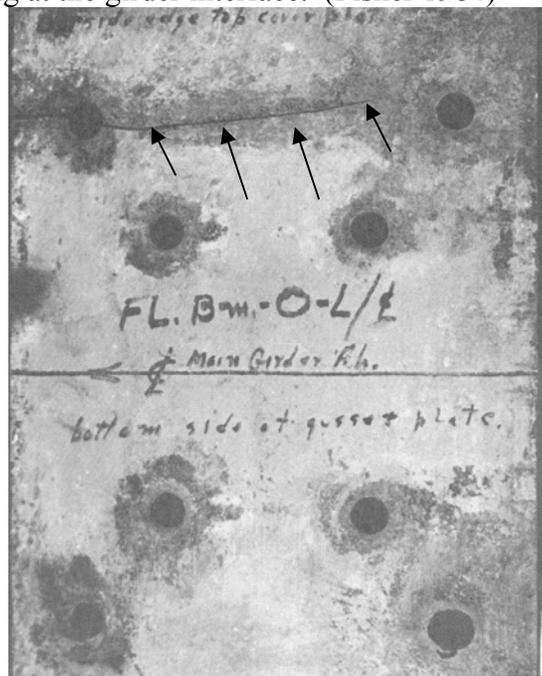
Crack through tie plate of Allegheny River Bridge (Adapted from Fisher 1984)
